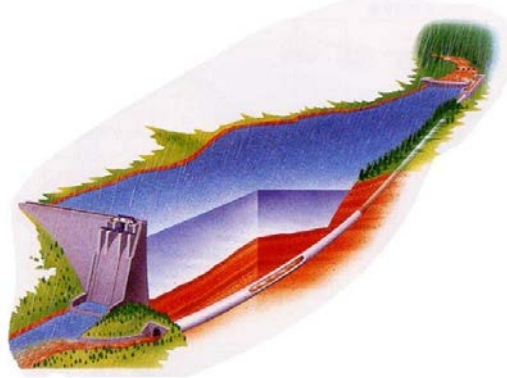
Sketch illustrating the bypass tunnel concept.
